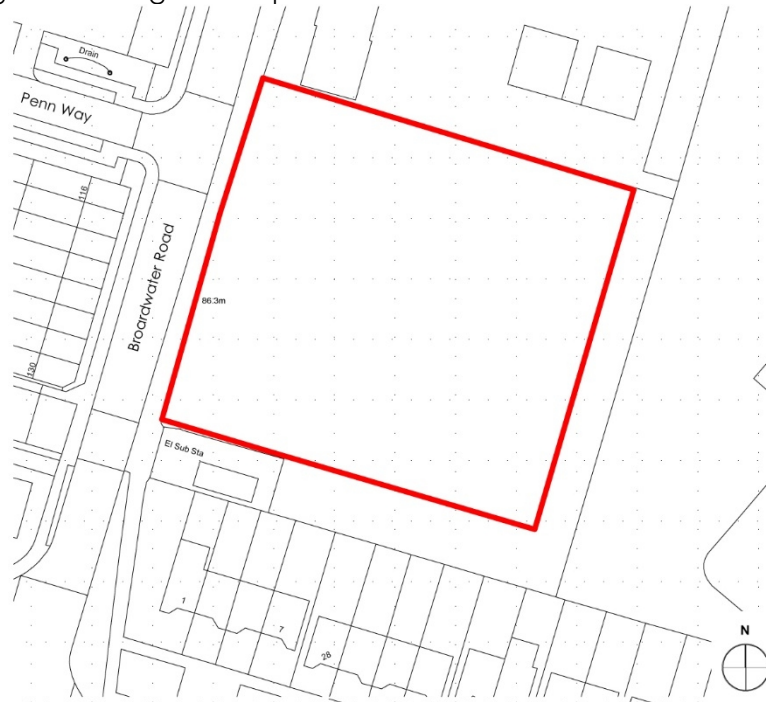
Site Location Plan [NTS] indicating site boundary extents
